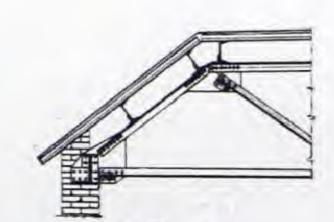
SLOPING END TRUSS WITH PROJECTING EAVES
